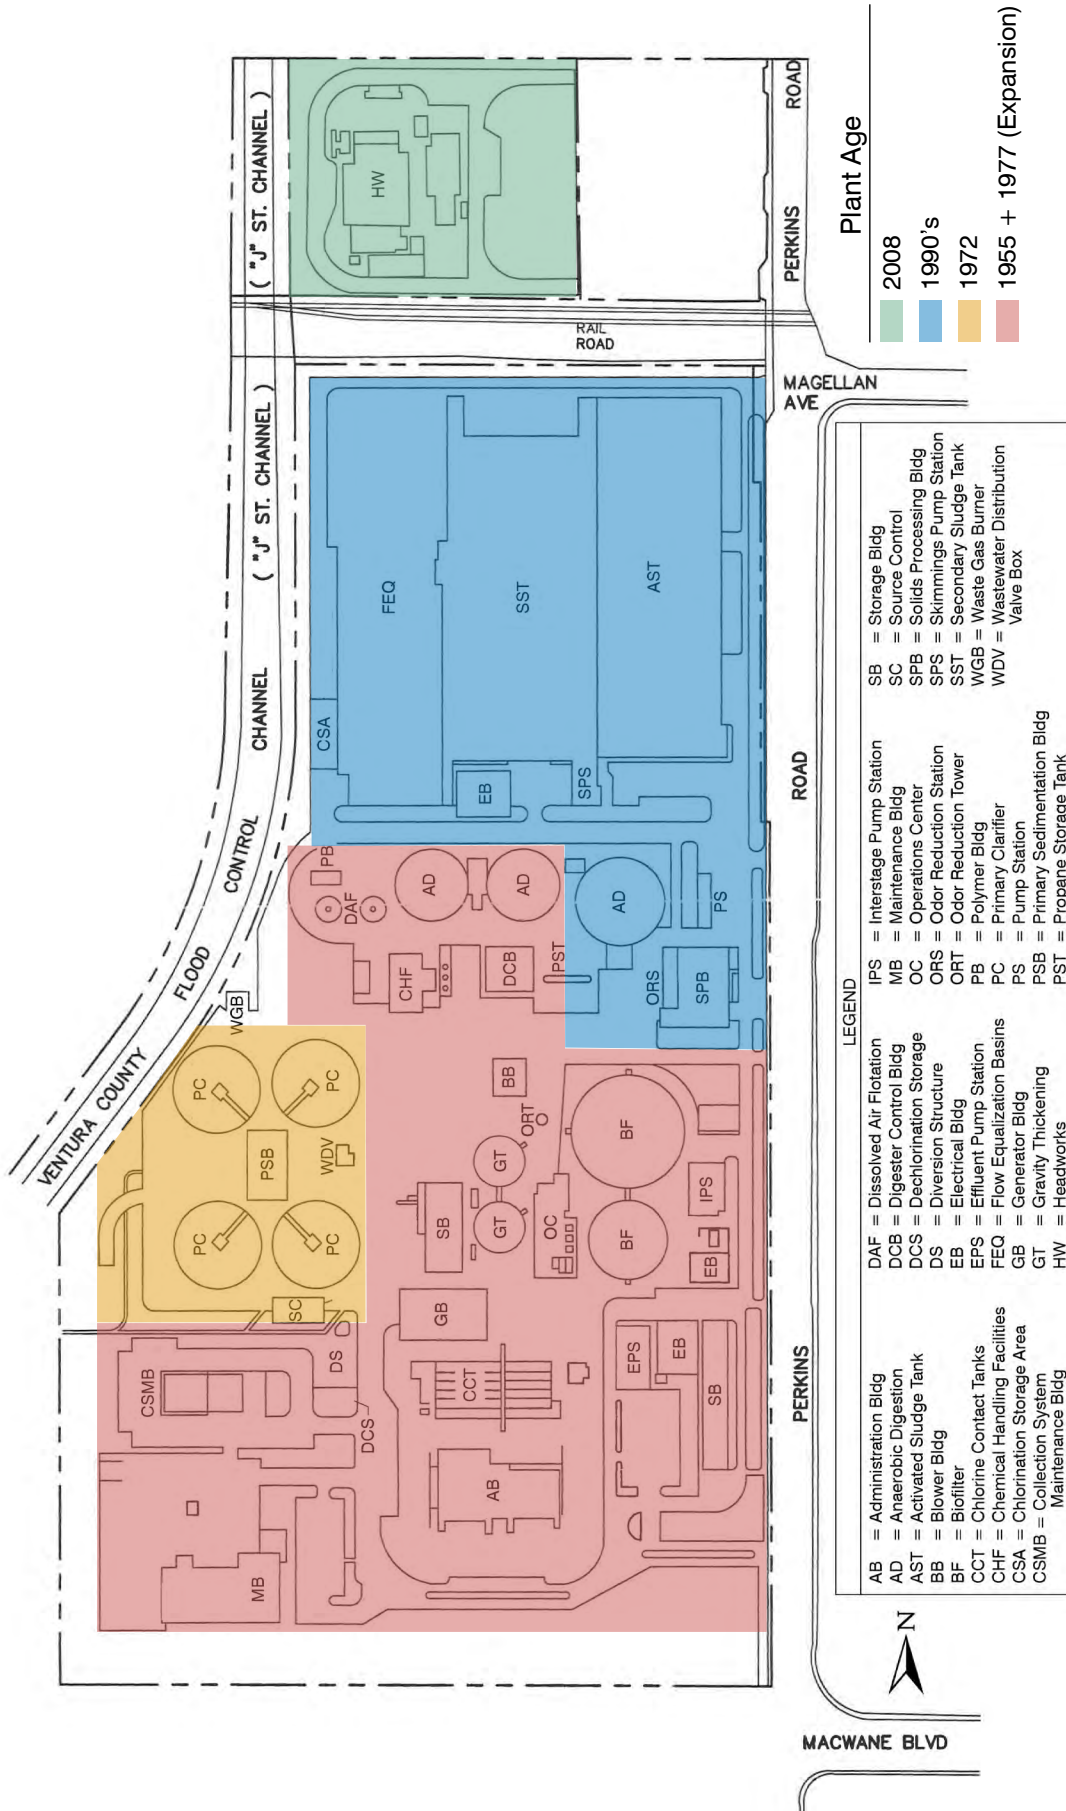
The Oxnard Wastewater Treatment Plant consists of preliminary, primary, and secondary treatment, effluent disinfection and solids handling facilities.
